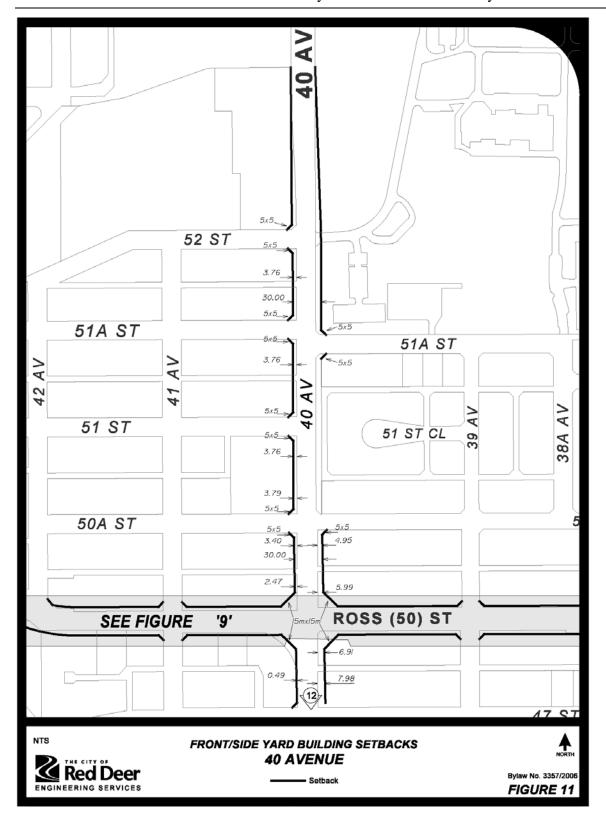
Front/Side Yard Building Setbacks 40 Avenue
